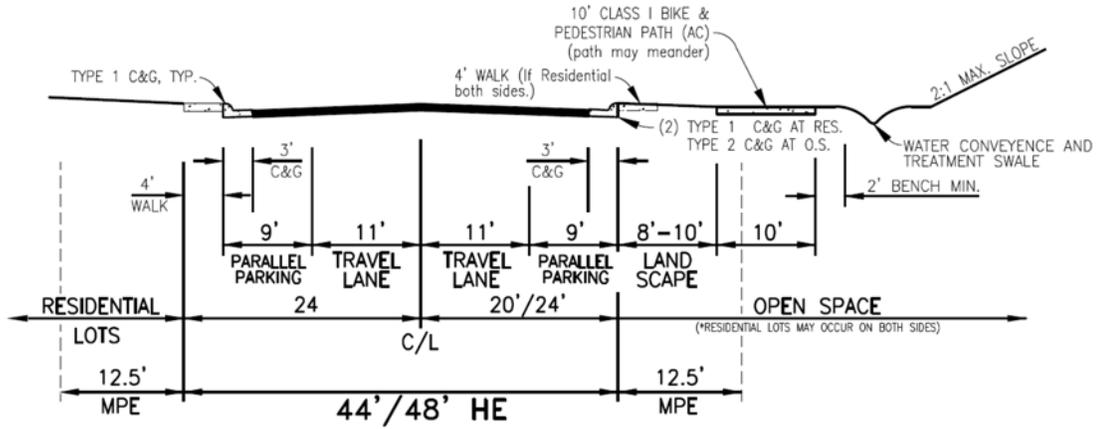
| Upper Ranch Road & Grand Ridge Drive (west entry only)
